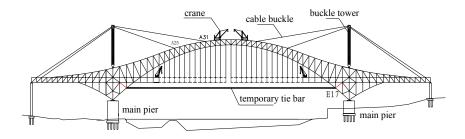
Layout for Arch and Steel Truss Closure at Mid-Span Asynchronous
